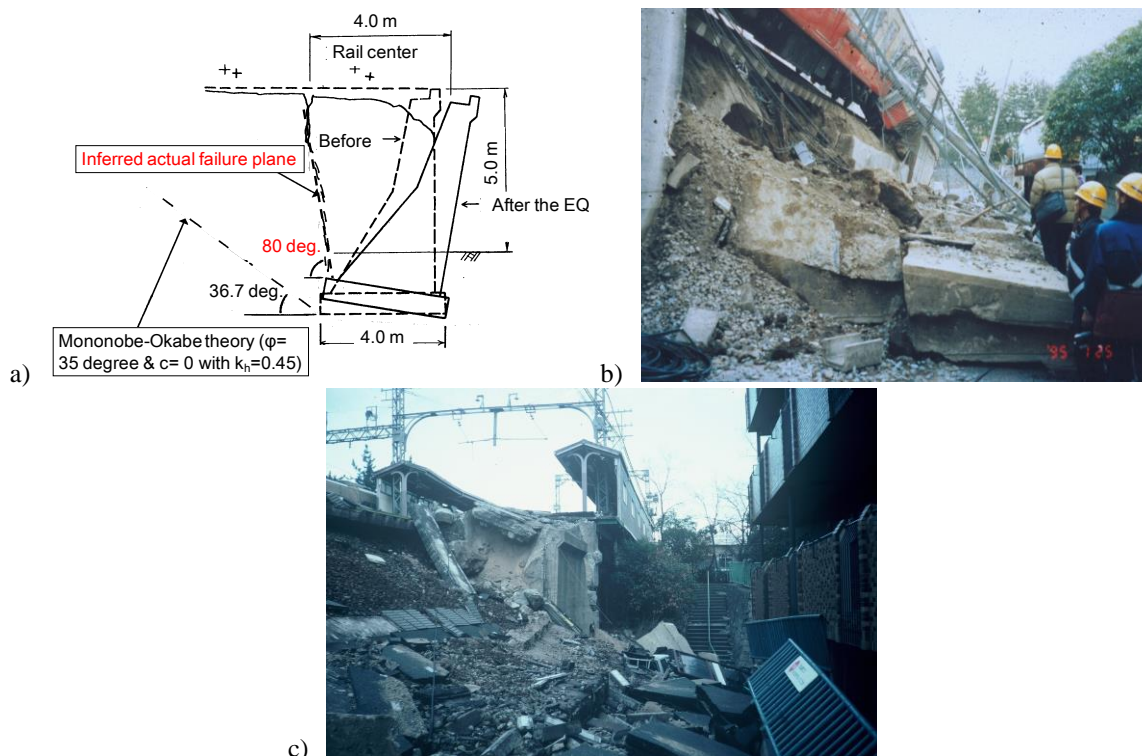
Typical gravity type unreinforced concrete RWs (without a pile foundation) that collapsed during the 1995 Great Kobe Earthquake, Ishiyagawa Station, Hanshin Railway (Tatsuoka et al., 1996, 1997a & b, 1998): a) a sketch of typical section; and b) & c) typical damaged sections on the opposite sides of the embankment.
